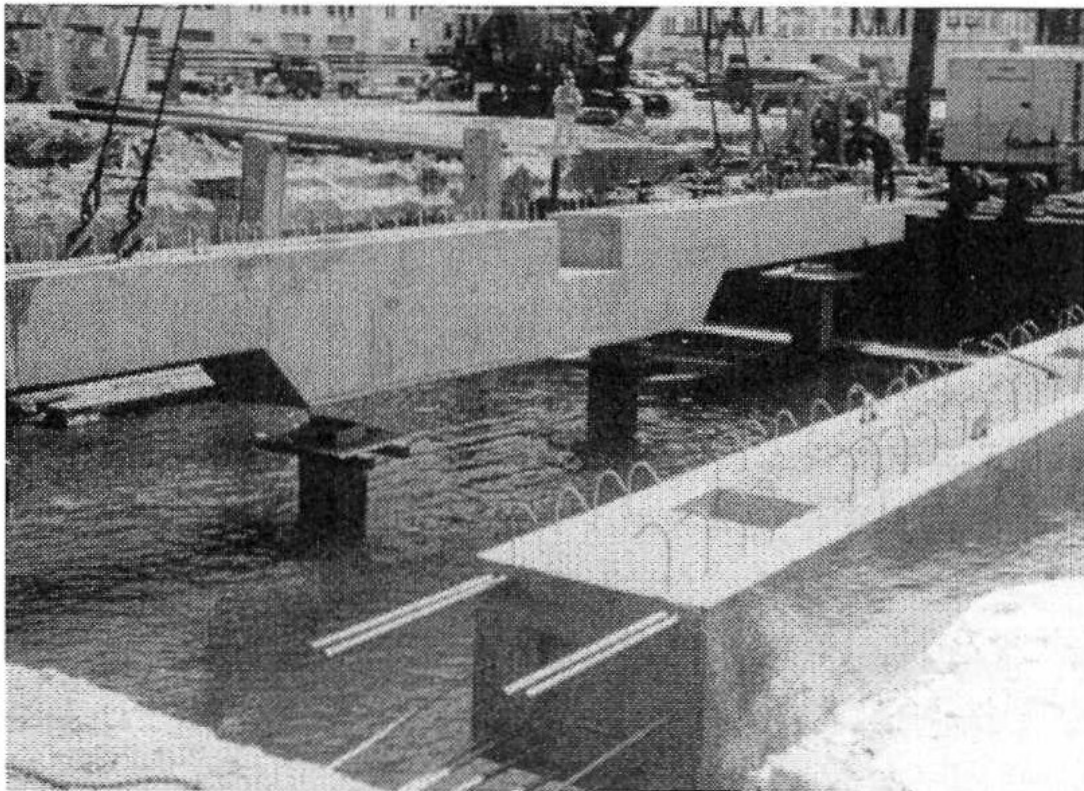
Precast concrete pile-cap (Port Engineering, 2004)
